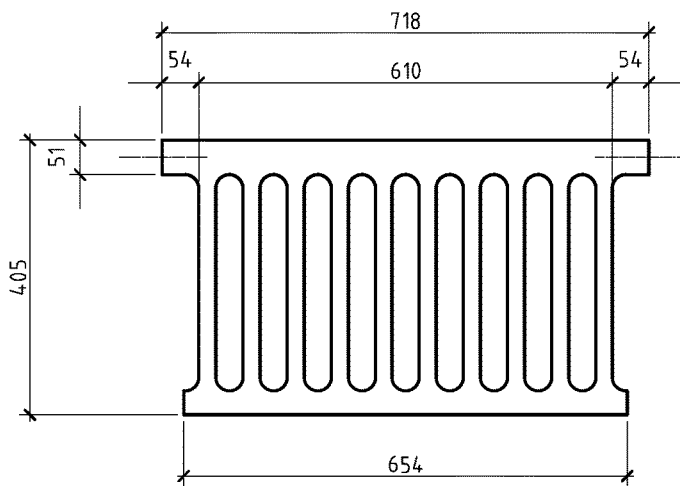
Traversable Grates for Precast Headwalls 255mm to 450mm culverts
